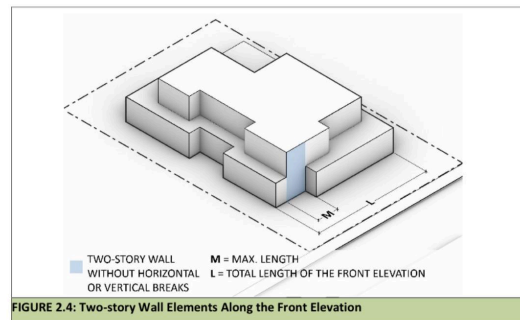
Two-story Wall Elements Along the Front Elevation
